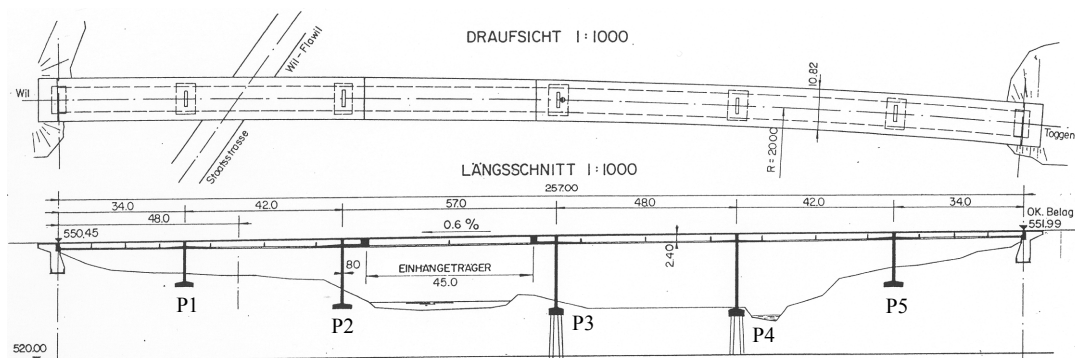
Plan view and elevation of Viadukt Mühle Rickenbach in SG
